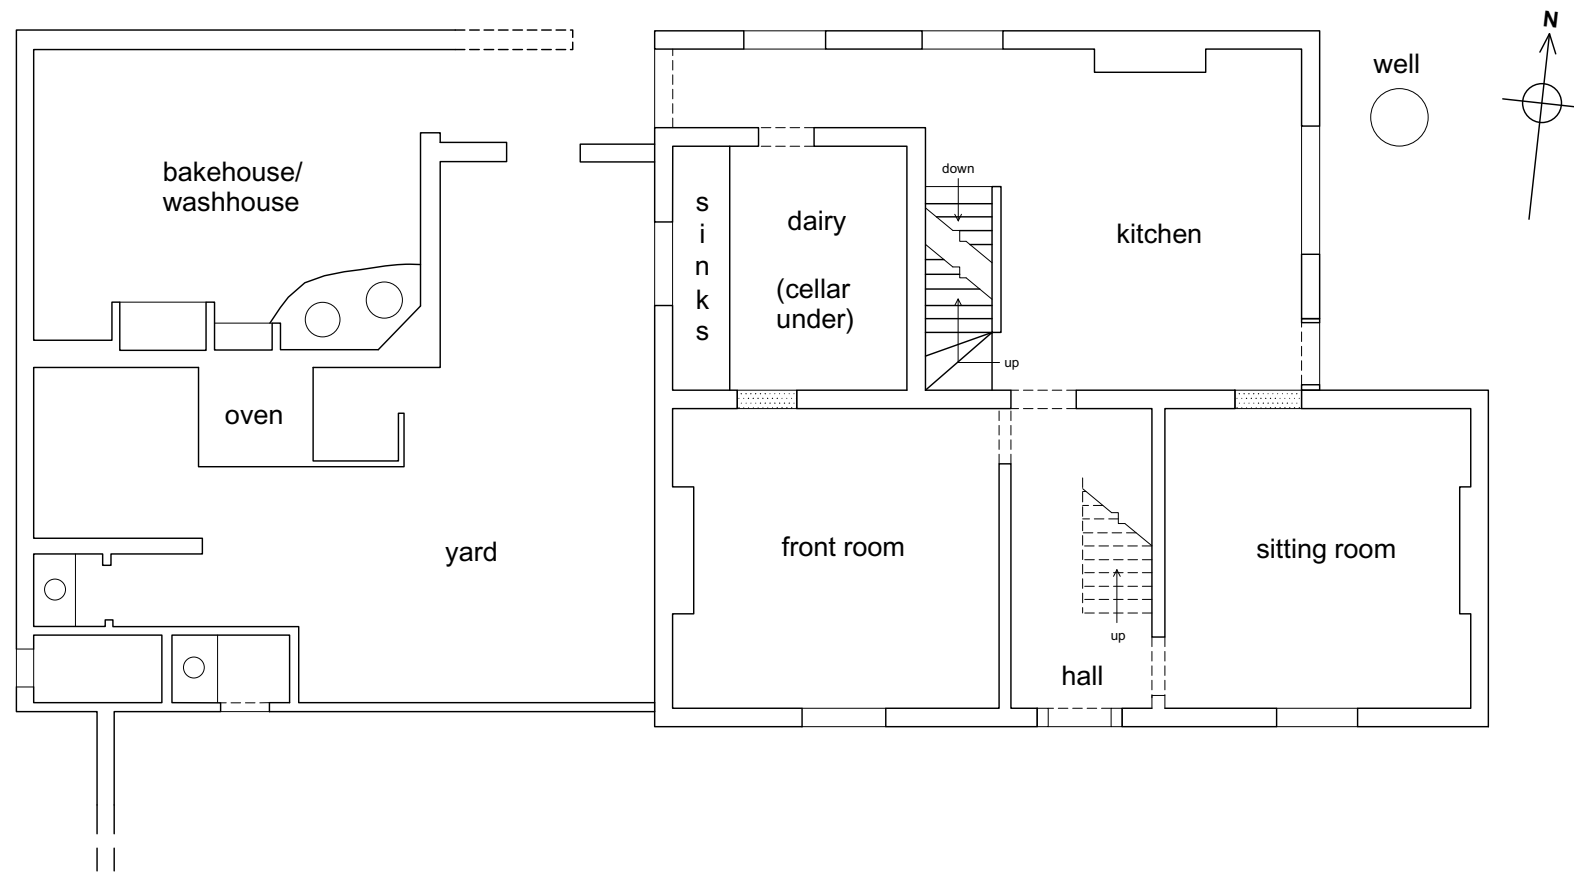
The farmhouse: floor plans (upper floors approx. only)
